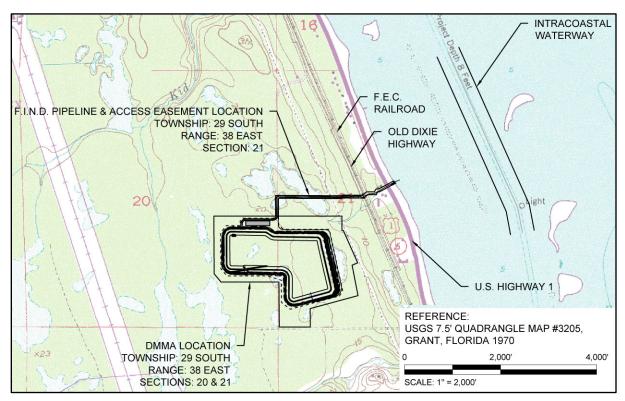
Detail of the BV-24A project area from plans provided by Taylor Engineering, Inc. (2018).
